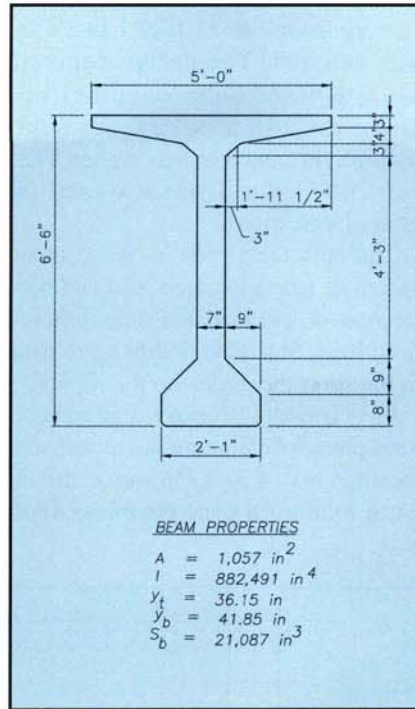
78 in. (1981 mm) bulb-tee girder.
